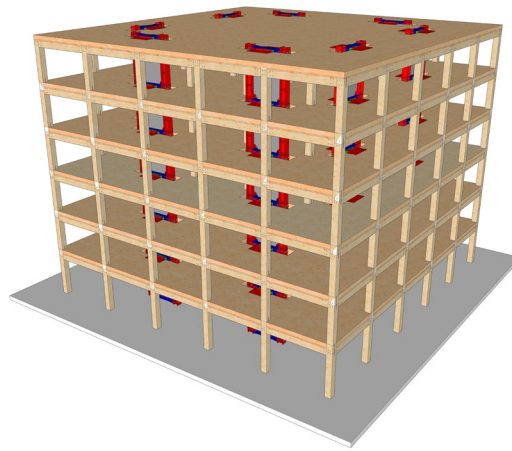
Proposed steel plate shear wall and timber frame hybrid structural system.
